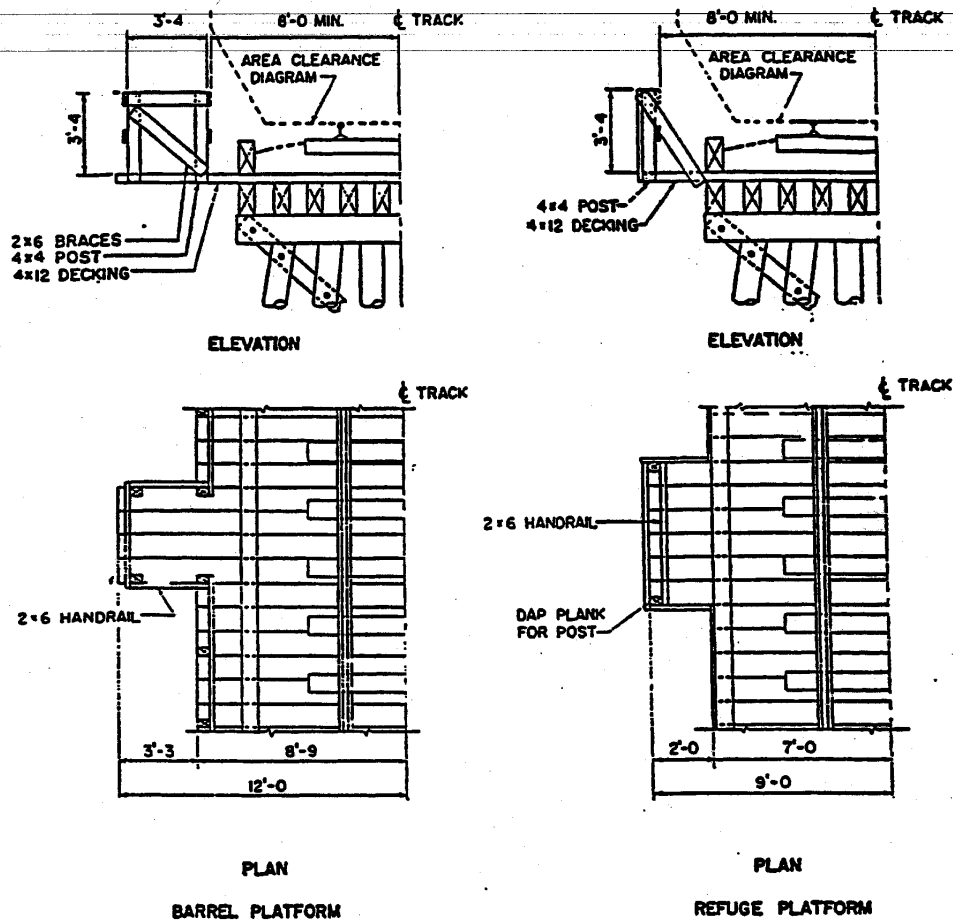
Track Car Platforms—Open-Deck Trestles—To Be Used Where Required
